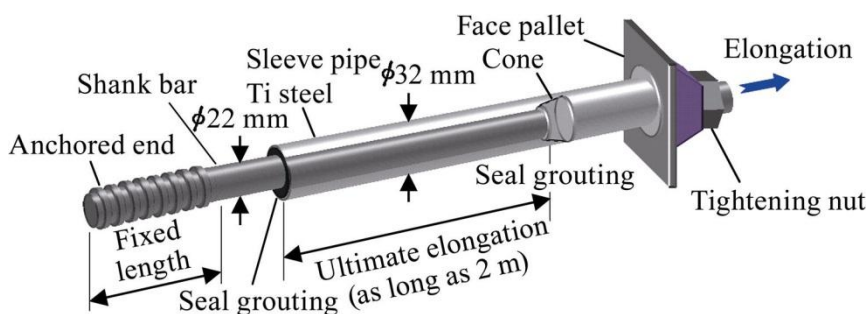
Schematic of the three-dimensional view of CRLD bolt
